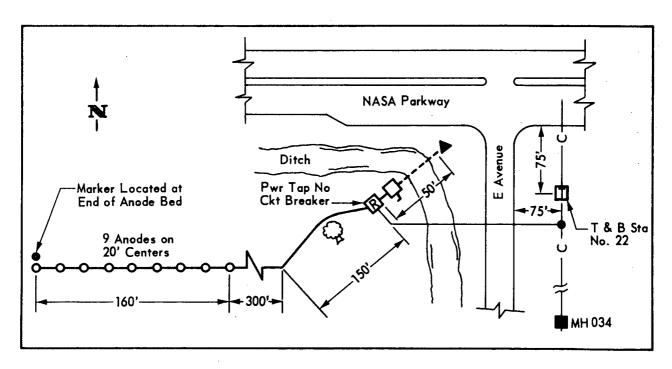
Site No. 24 and Test and Bond Station No. 22 Equipment Locator
